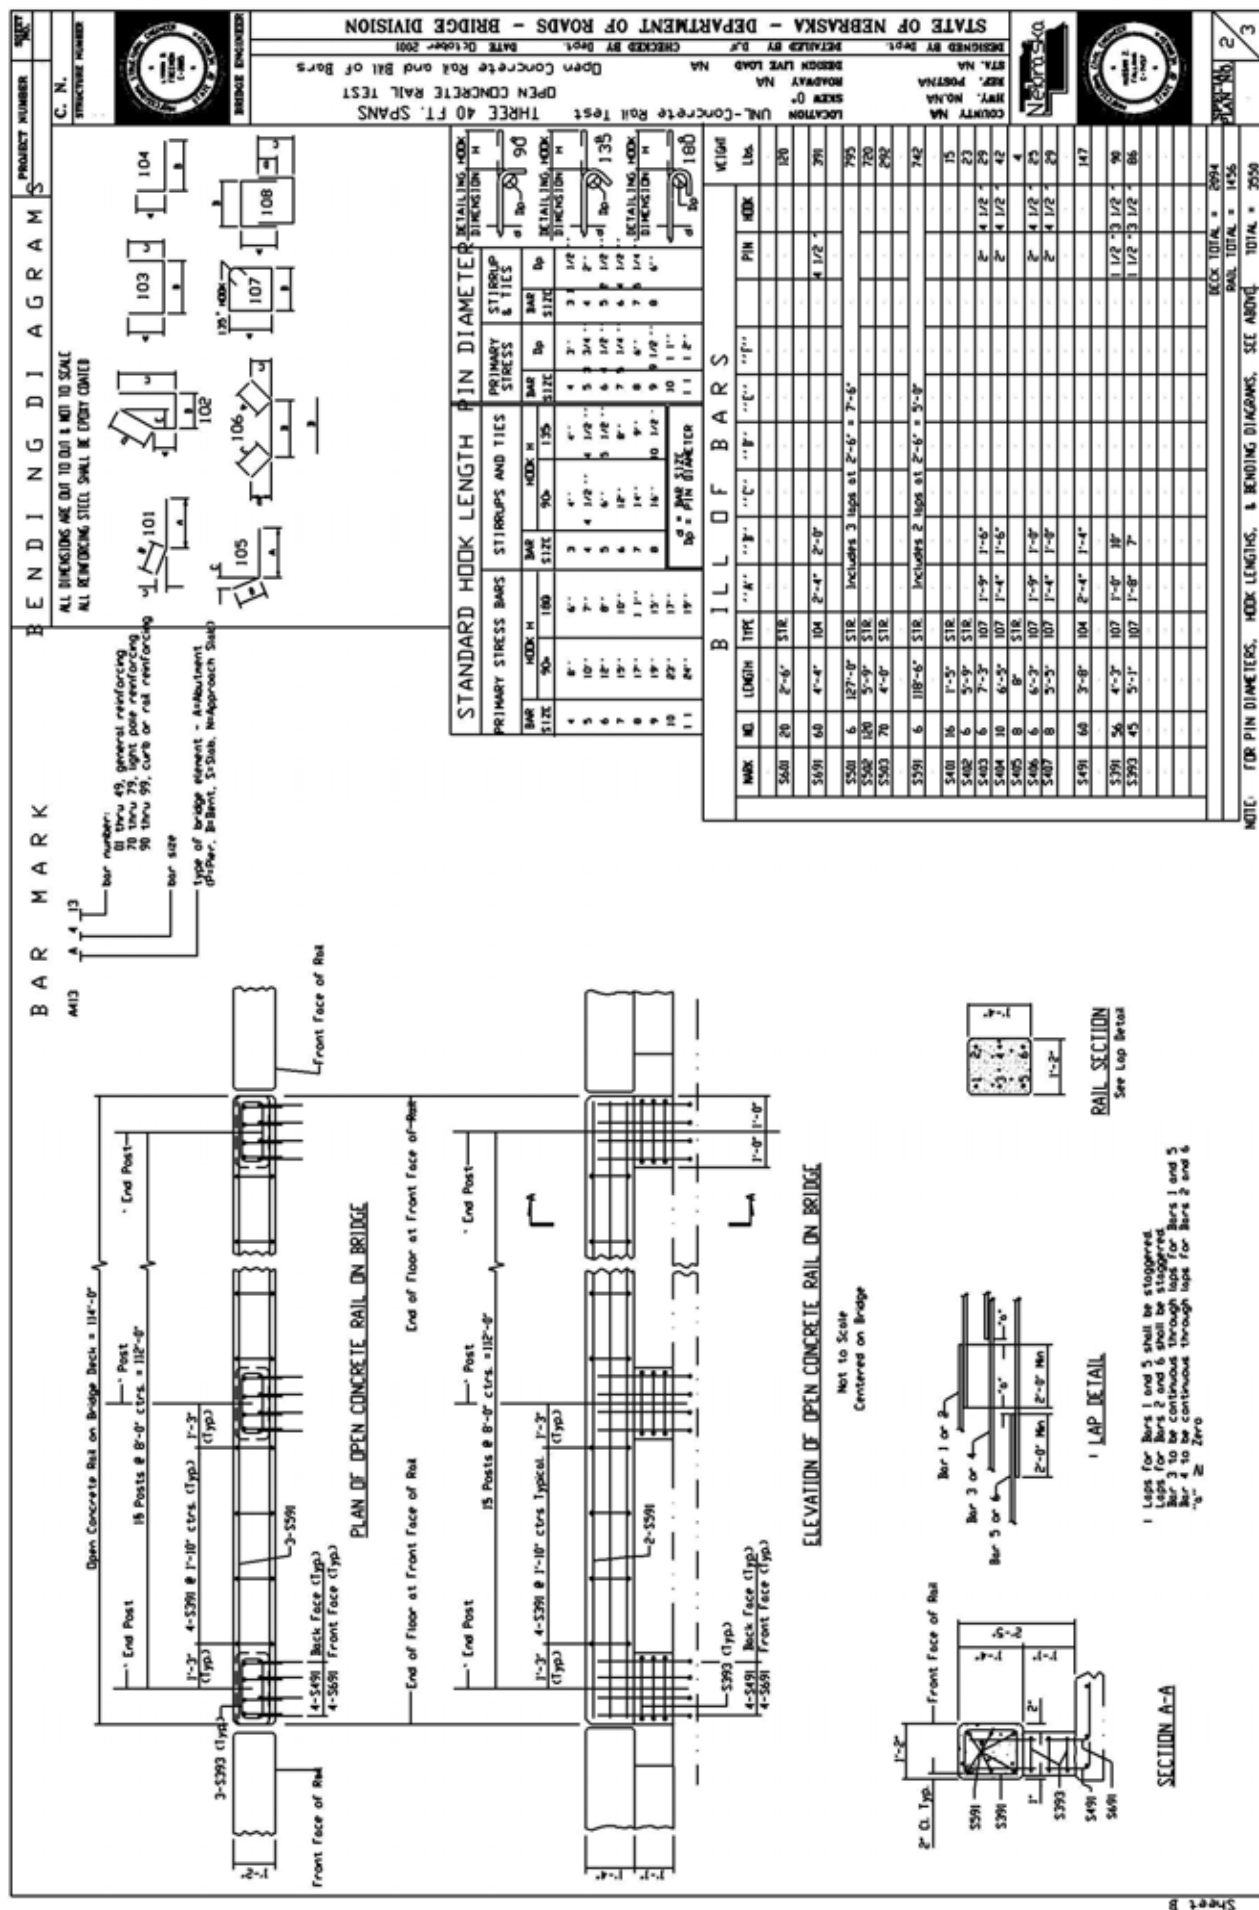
NDOR's Open Concrete Bridge Rail Standard Plans (English)
